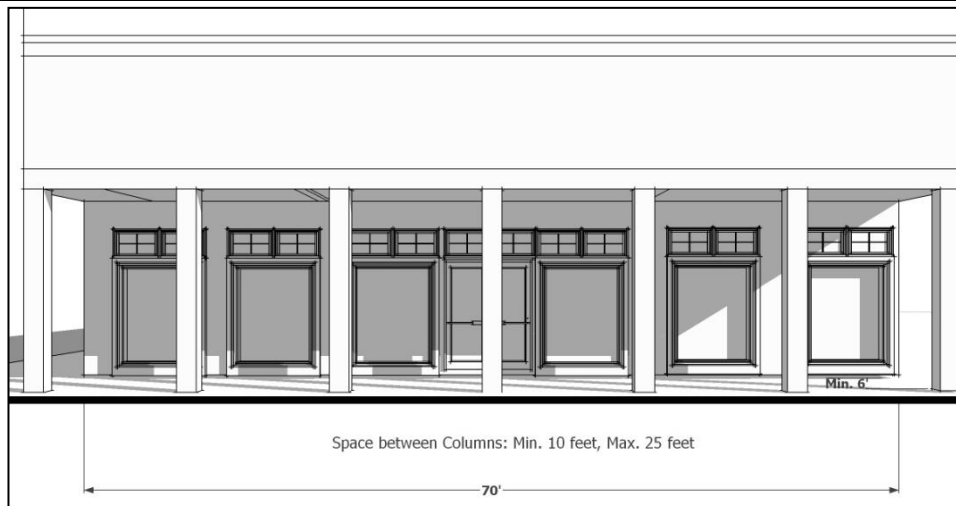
Arcades create a semi-public transition from the sidewalk to the building
